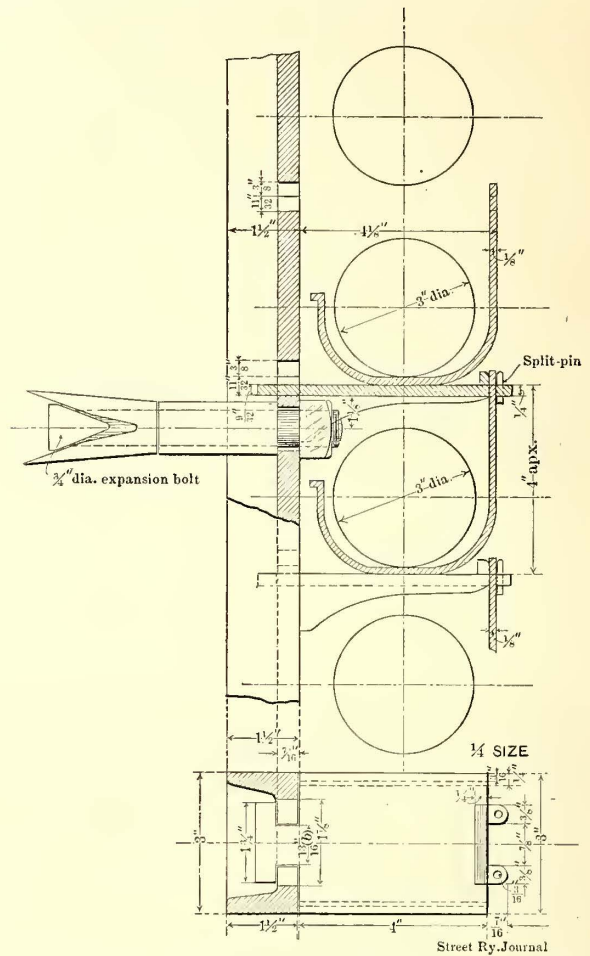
SHOWING METHOD OF SUPPORTING CABLES IN TUNNEL WALLS
